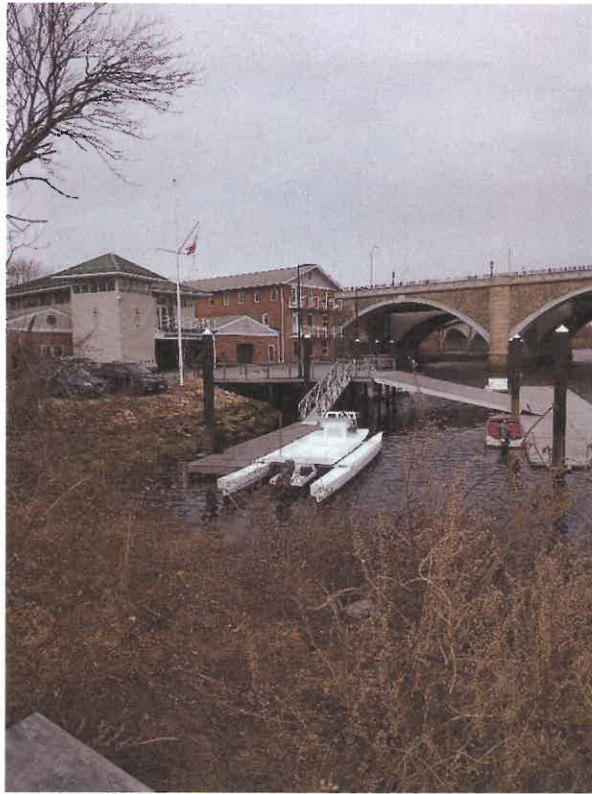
Coastal Feature #6 (Riprap revetment against stone wall) at southwest corner of bridge. See Figure 2.
